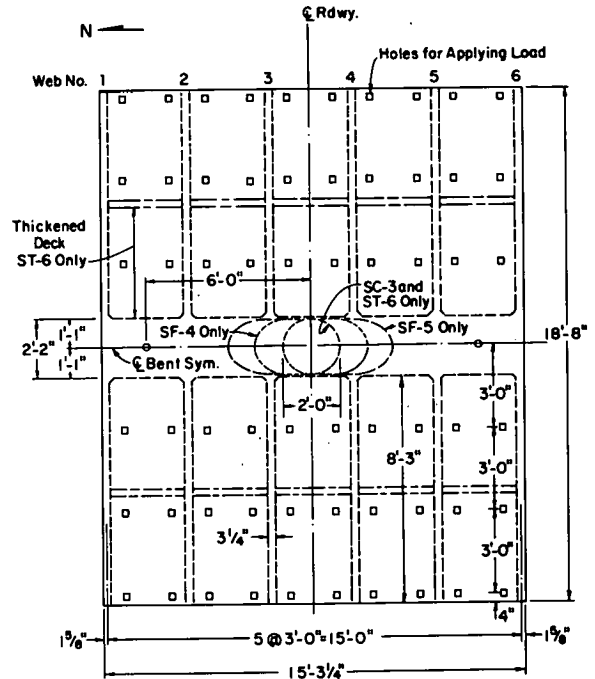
Plan of Single-Column Bent Cap Specimens
